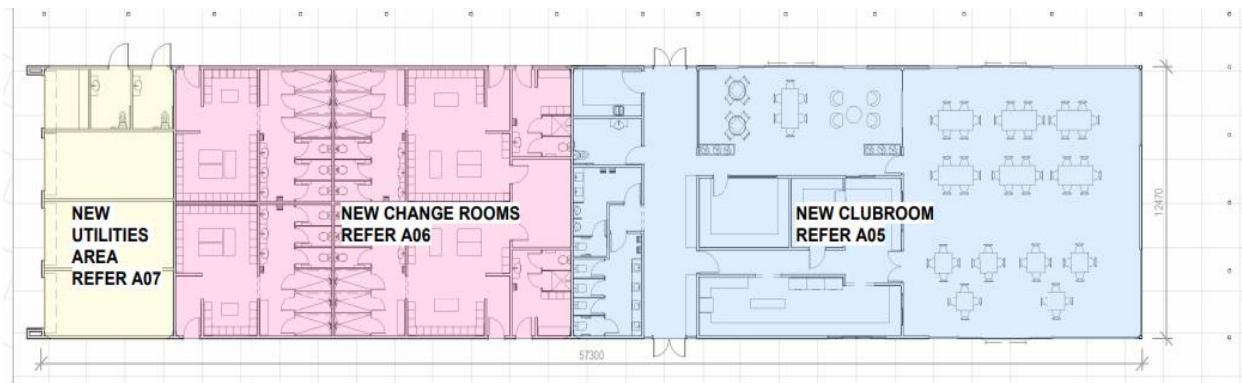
Concept Floor Plan for Kalara Reserve Changeroom & Clubroom
